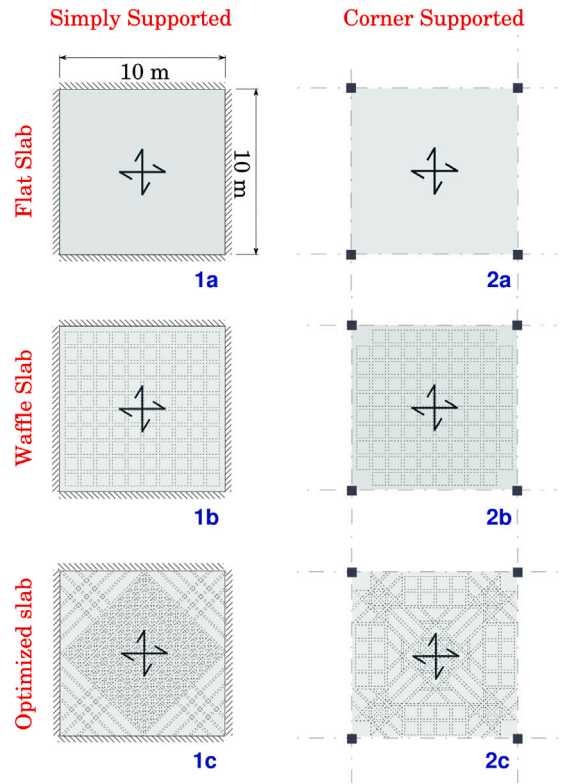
Single bay slab: 1. simply supported on all four sides case, and 2. corner supported on four columns, assumed to provide fixed supports; paired with a. flat slab, b. waffle slab and c. optimized grillage slab.
